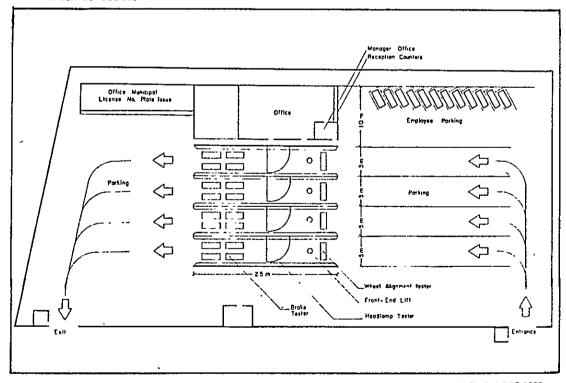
PAITILLA COMMERCIAL VEHICLE INSPECTION CENTER LAYOUT
